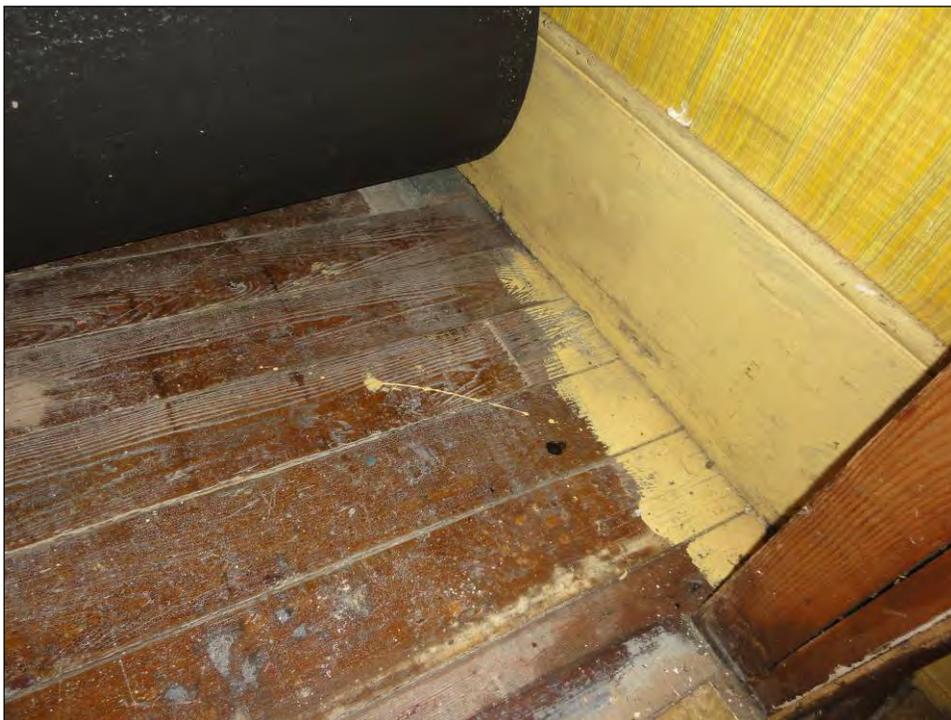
detail of original baseboard and floorboards, located underneath the linoleum floor in closet under the stairs.
